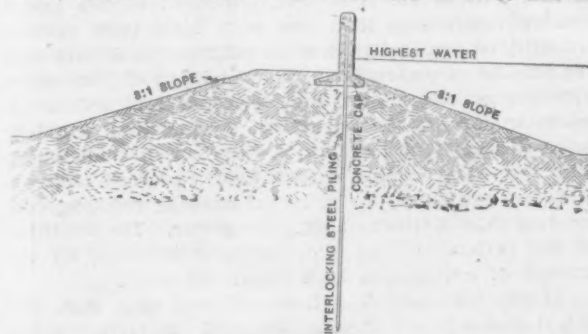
Another Reinforced Levee with the Piling Projecting, Forming a Wall.
